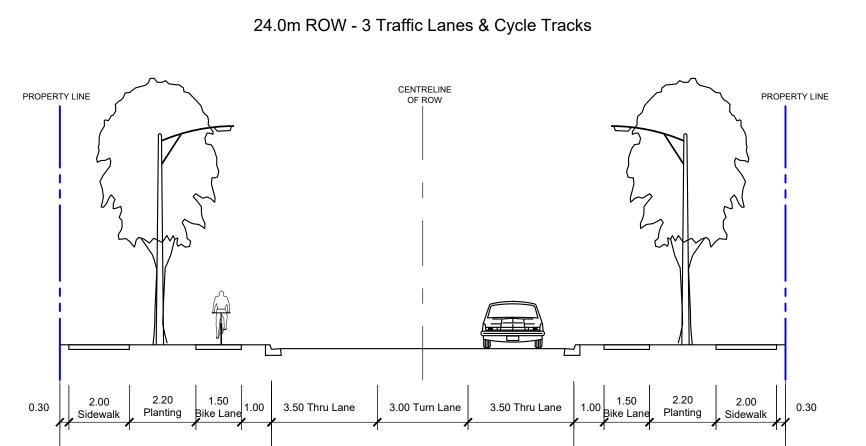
, Road Network - Rights-of-Way, June 2021
